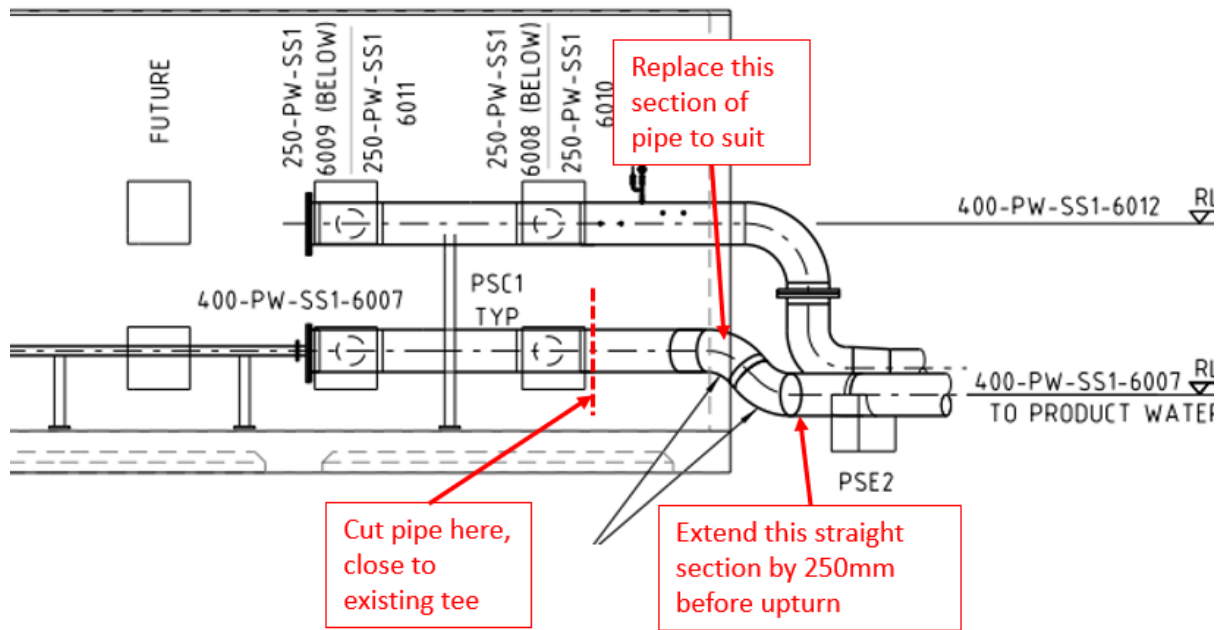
TP06 - modifications required. (ref Drawing No 15270-621)
